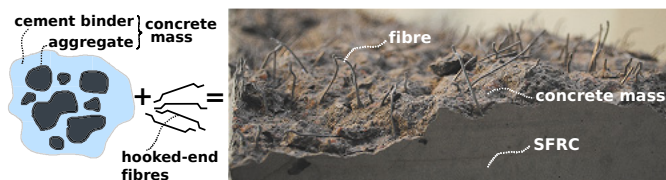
Cross-section of a cast SFRC structure. Concrete reinforced by short hooked-end steel fibres, SFRC.
